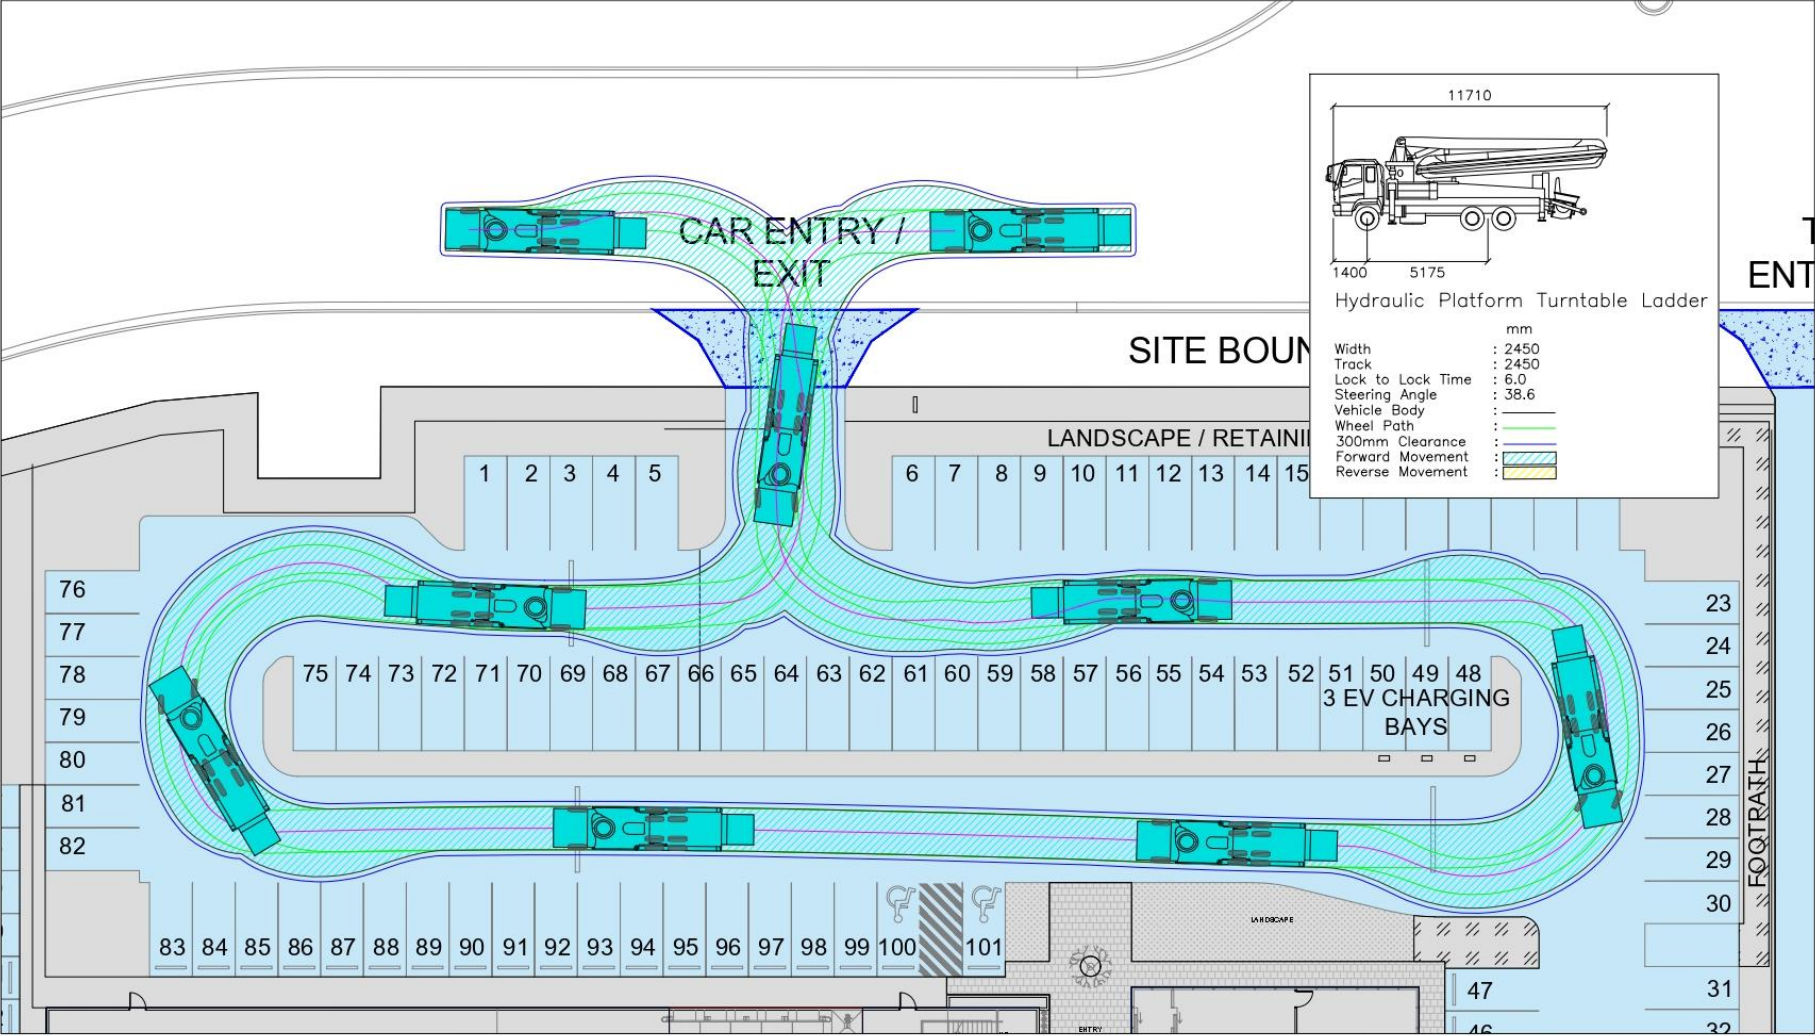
HYDRAULIC PLATFORM TURNTABLE LADDER MANOEUVRING
